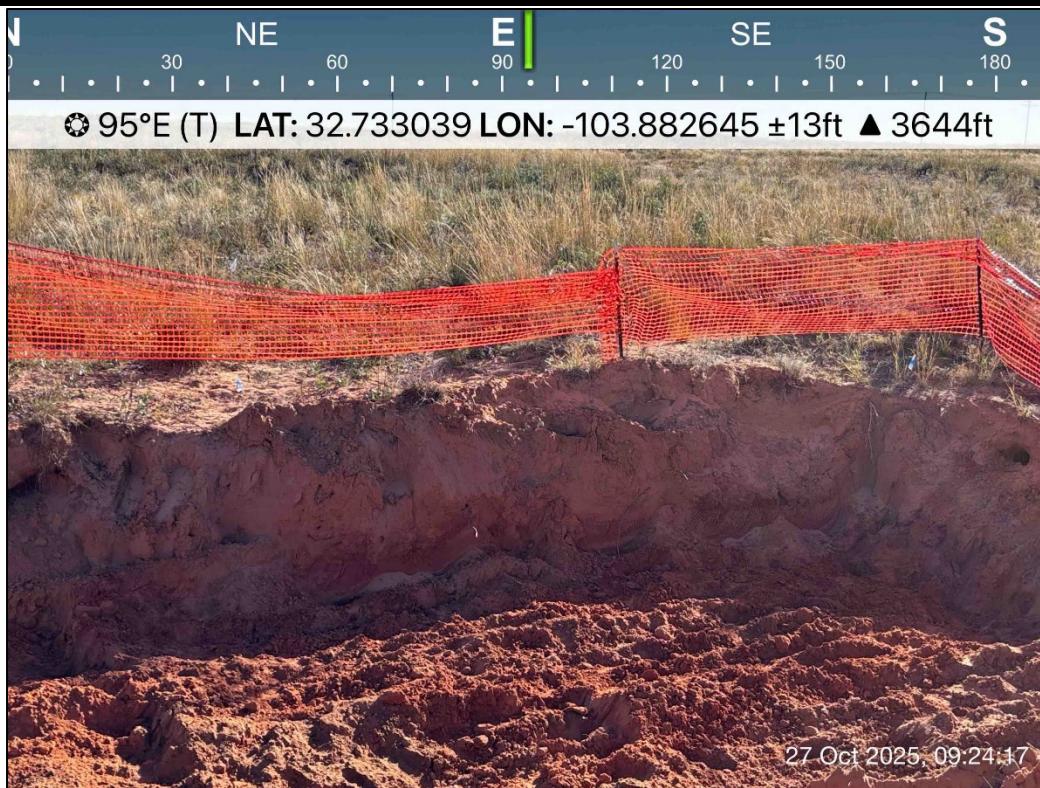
Eastern view of excavation extent. 10/27/2025
